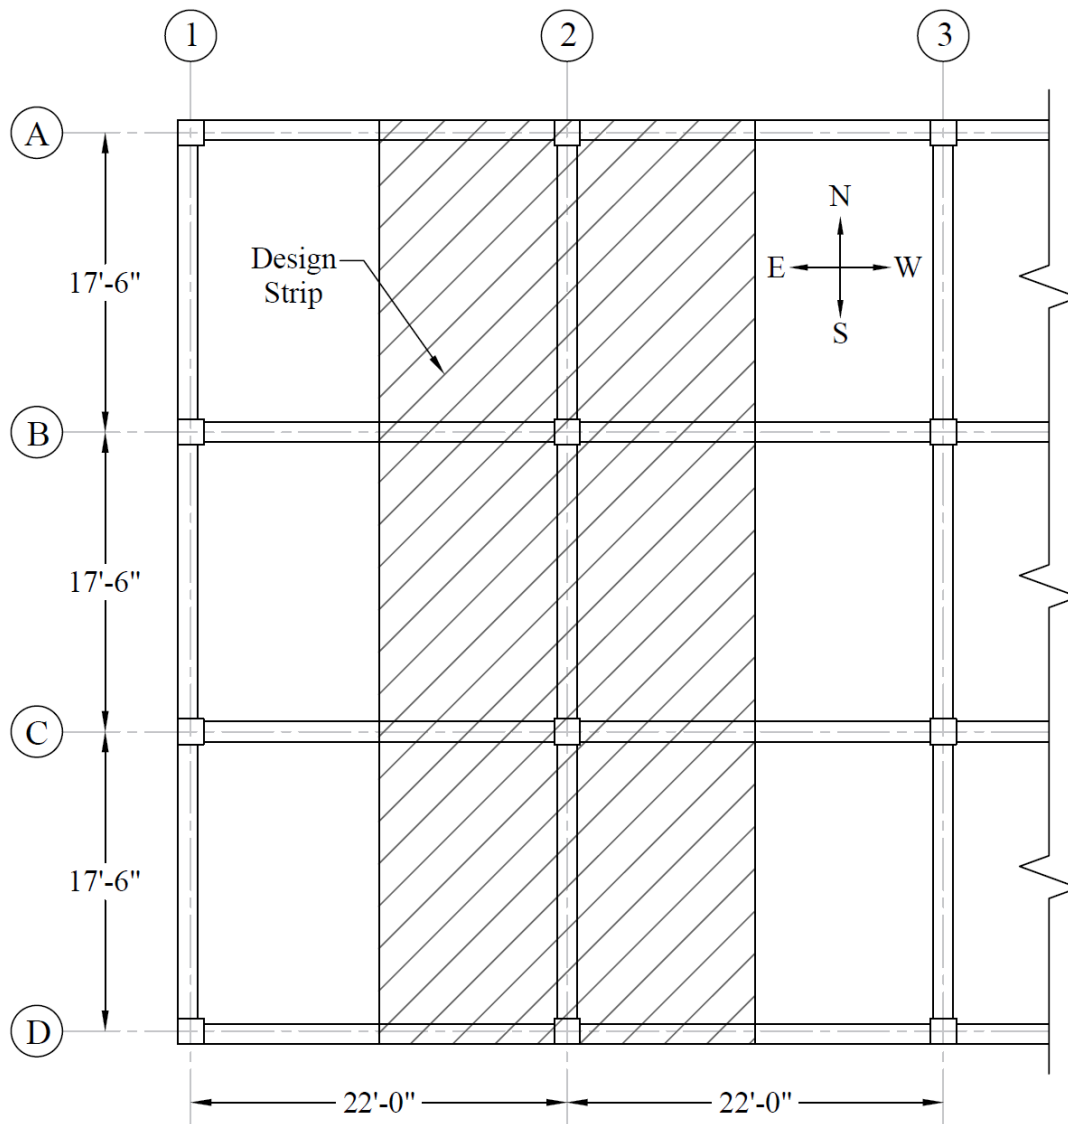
Two-Way Slab with Beams Spanning between all Supports
